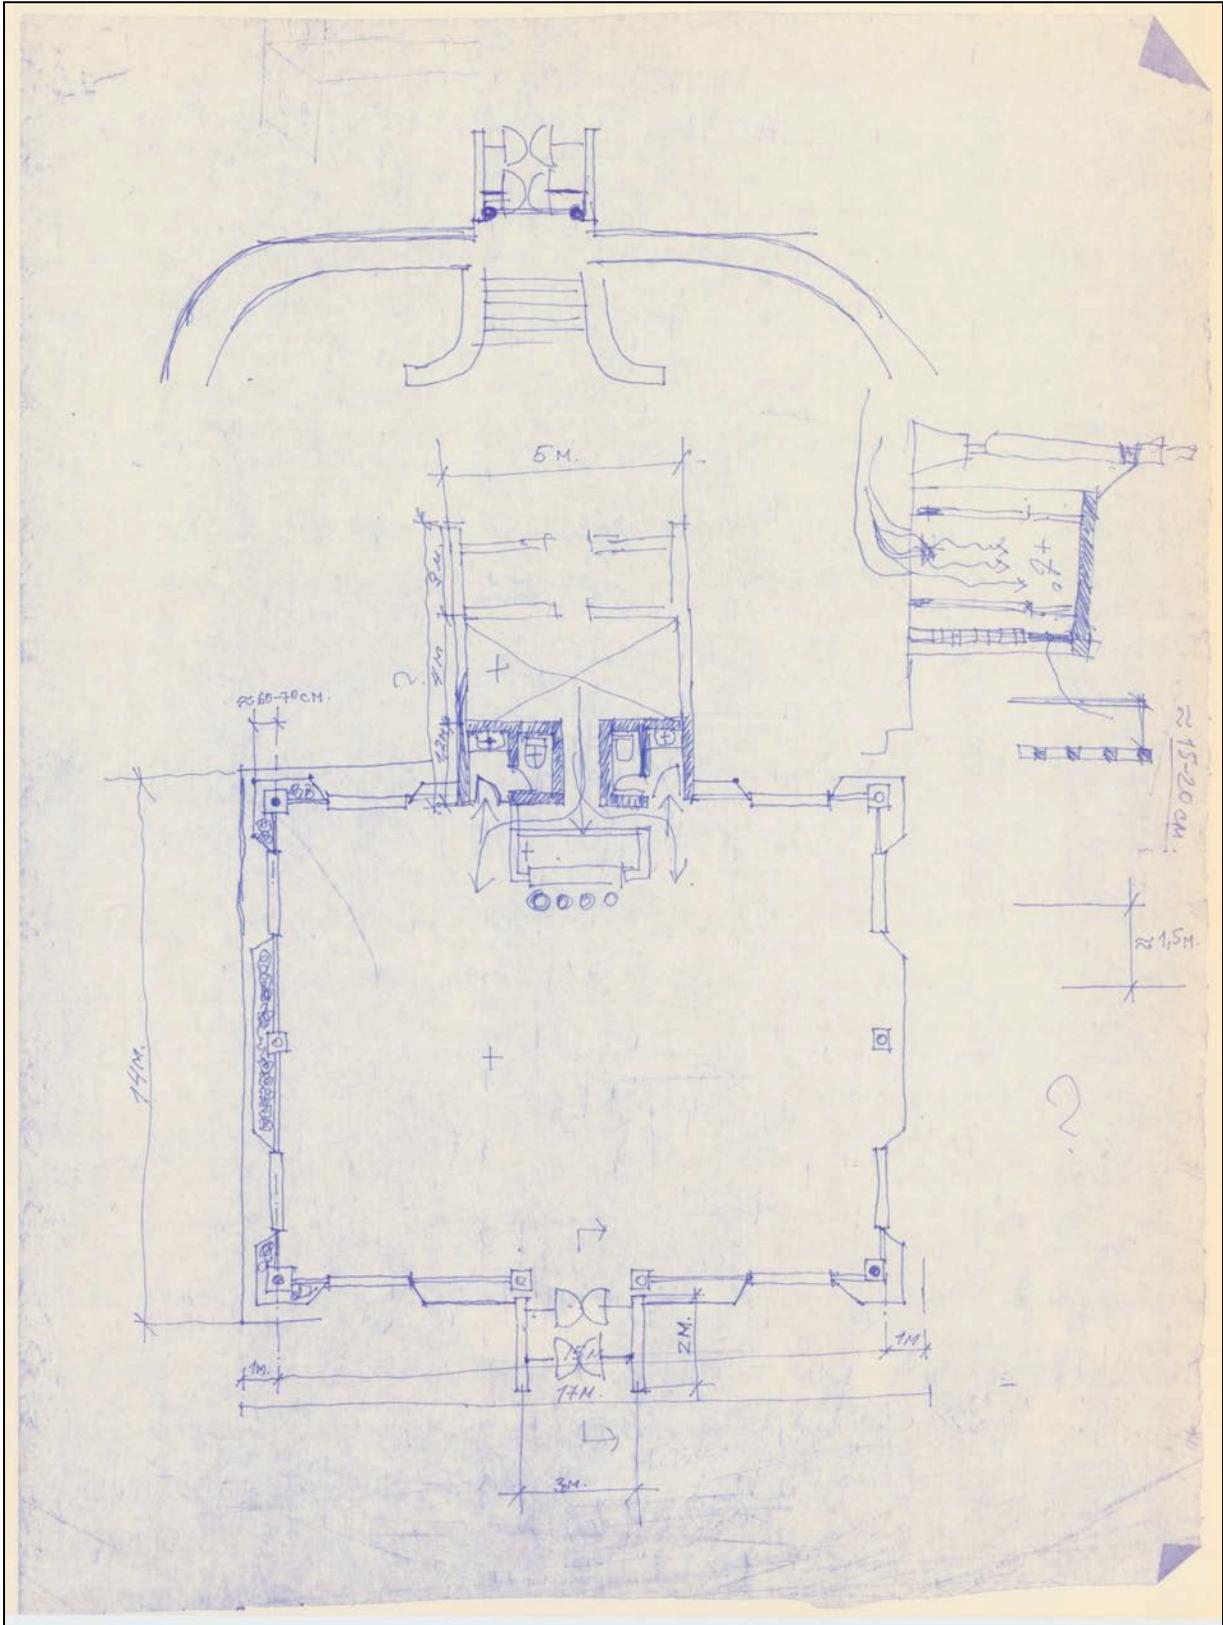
Architect Lado Shanidze's Sketch 1, Plan for modifications, 1989
